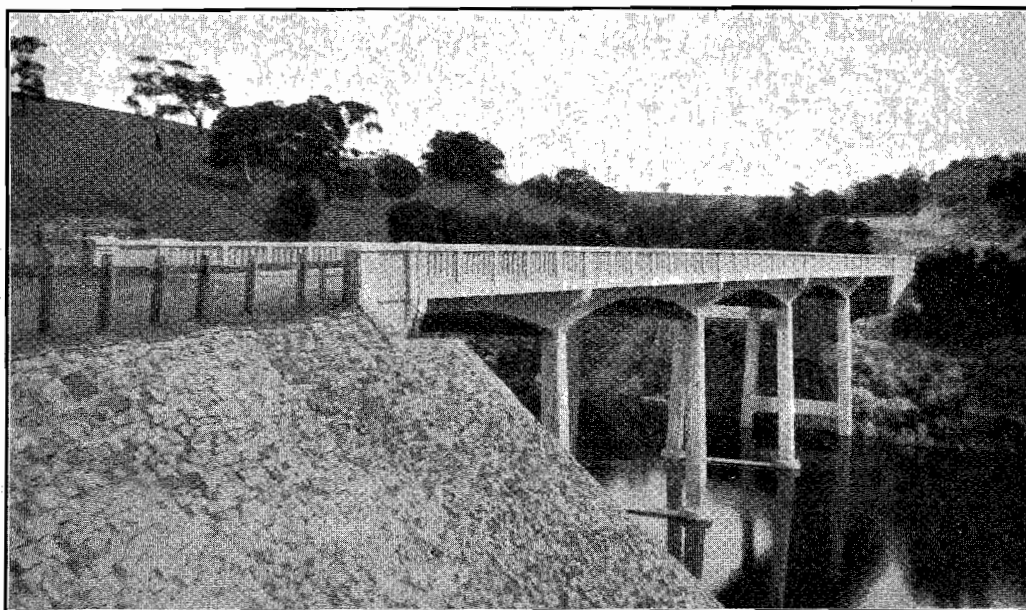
Western Highway. Bridge at Pyke's Creek Reservoir.
